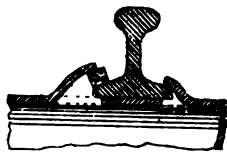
STEEL SLEEPER WITH JAWS FORMED ON IT FOR AN UNDERGROUND TRAMWAY.
